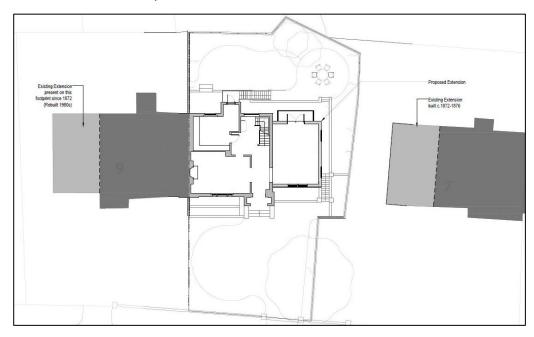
(above): Proposed site plan showing side extension to No. 8 as it would be built. This clearly demonstrates a substantial gap remaining between the building lines of Nos. 7 and 8.
